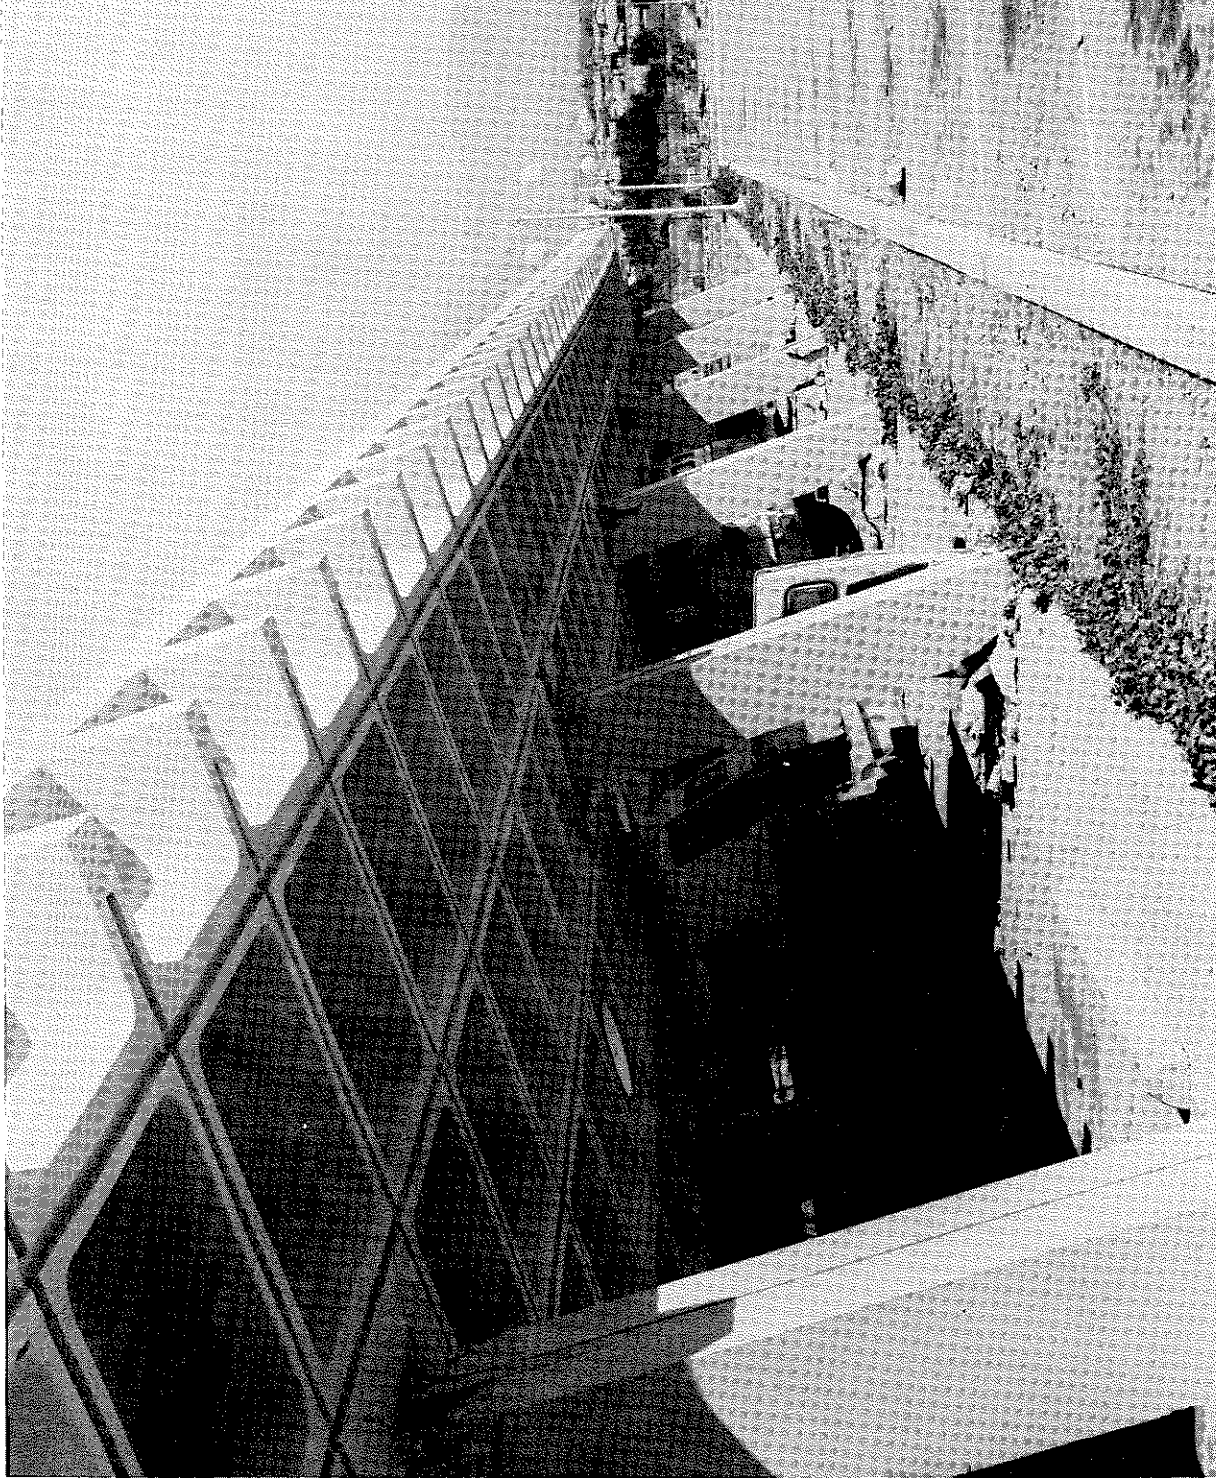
35 Concrete canopy collapsed onto ambulances at Olive View Hospital, just south of main building. The columns were originally vertical.
